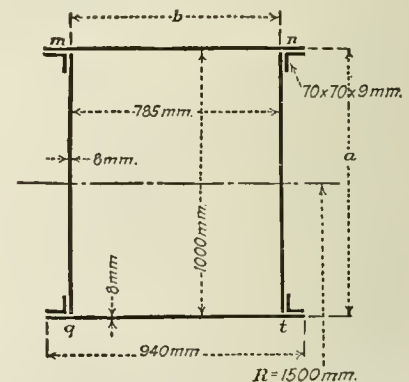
CROSS-SECTION OF FAIRBAIRN CRANE BOX GIRDER
